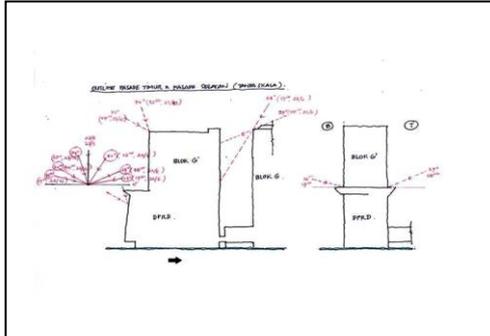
The angles of direct sun light on east, east and south building façades (elevation) [4]
